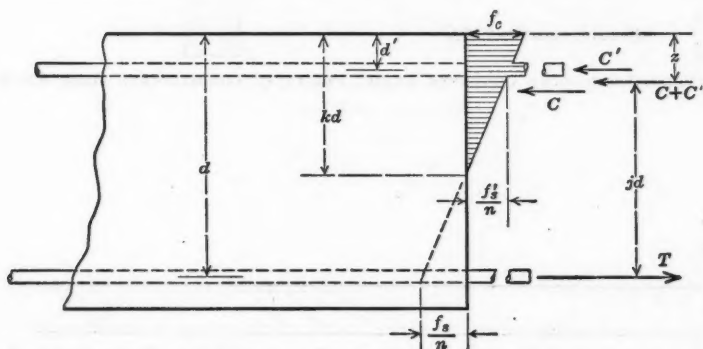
NOMENCLATURE FOR CONCRETE BEAM REINFORCED FOR TENSION AND COMPRESSION.
